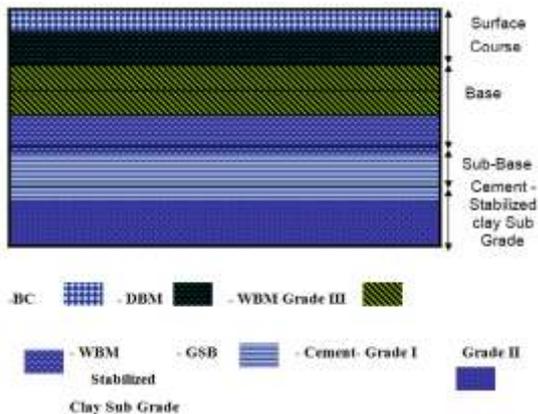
Composition of flexible pavement on Cement-Stabilized clay sub grade
